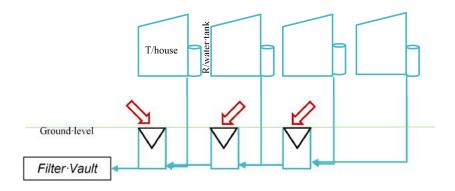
Schematic of the runoff pathways for the townhouse development at Ormiston. The red arrows indicate stormwater runoff entering the pit baskets. Excess rainfall (blue lines) enters the central drainage pipe, which then passes into the filter vault.
